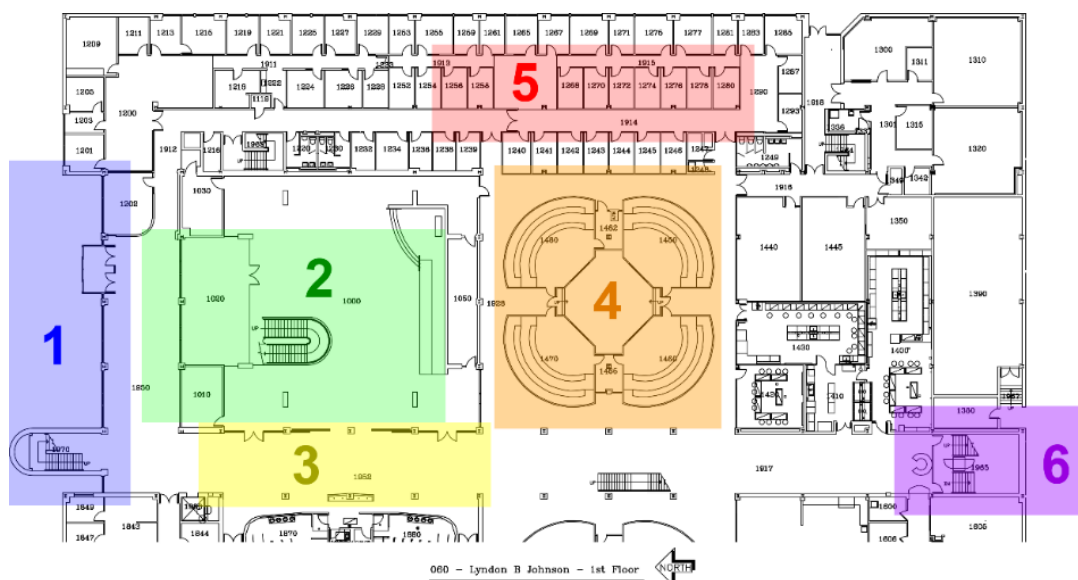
First Floor Plan for LBJ Building (East Half)
